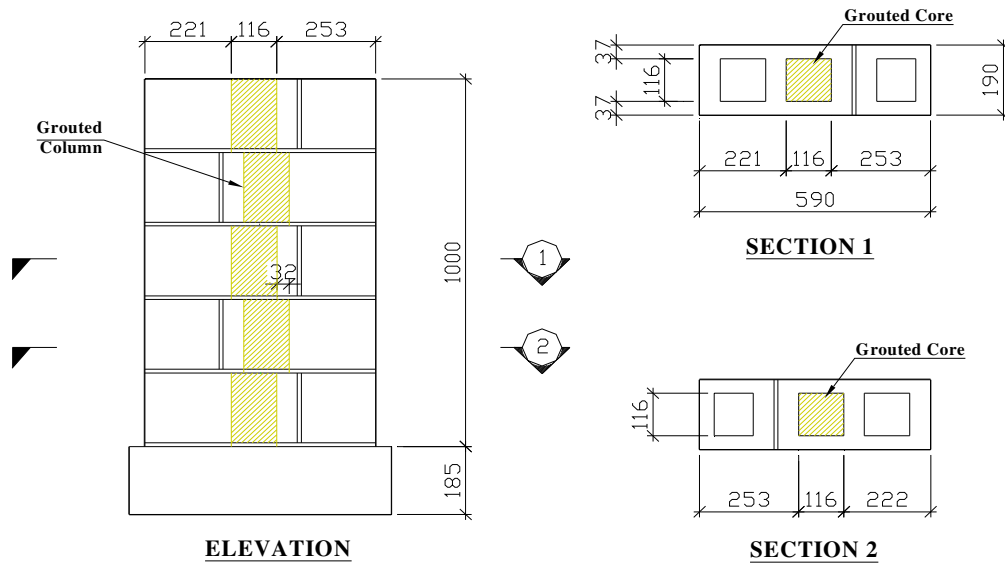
Dimensions and configurations of partially grouted concrete block wall specimens.
